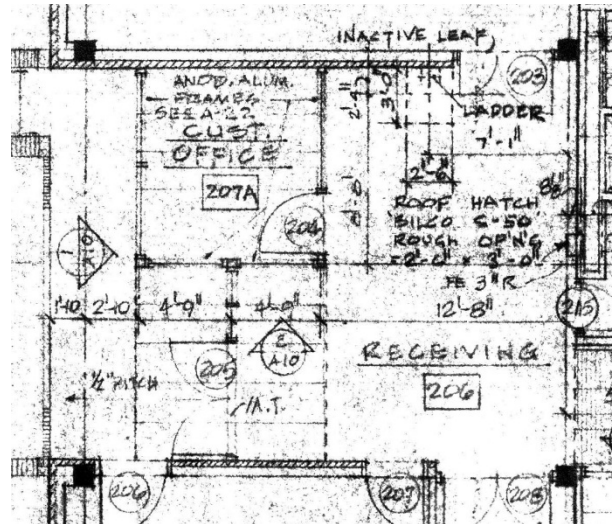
Plan at loading dock and receiving area, showing storefront assembly forming Room 207A and exterior door no. 205. [From 1968 Drawing A-10.]
